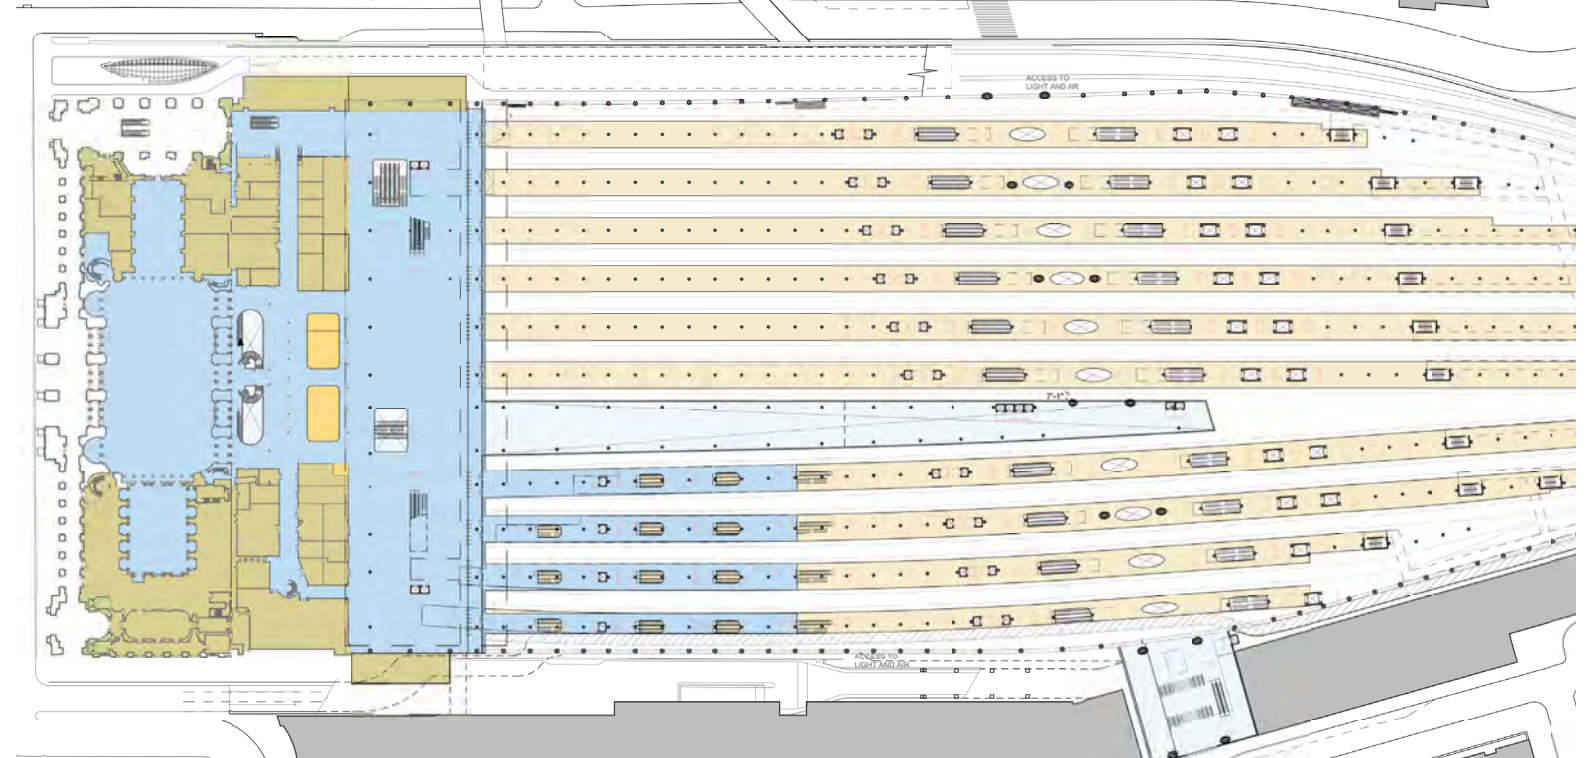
PLATFORM LEVEL PLAN - TI-14 SCENARIO
